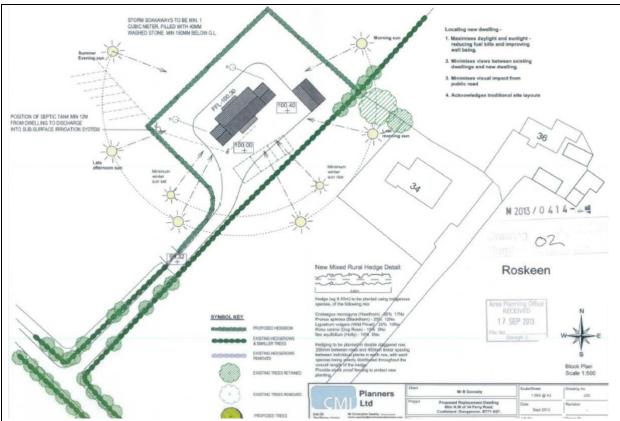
Block plan of dwelling and garage approved under M/2013/0414/F
